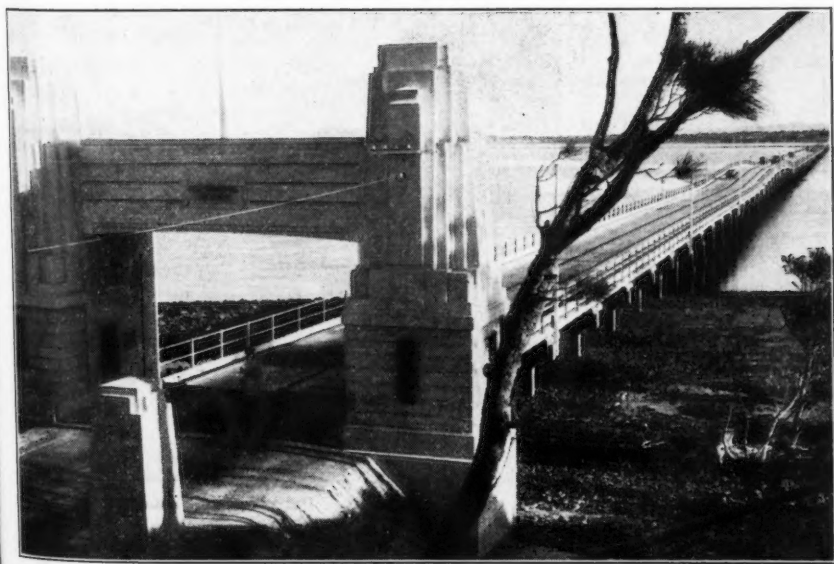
TOLL HOUSE FOR THE HORNIBROOK BRIDGE, AUSTRALIA
